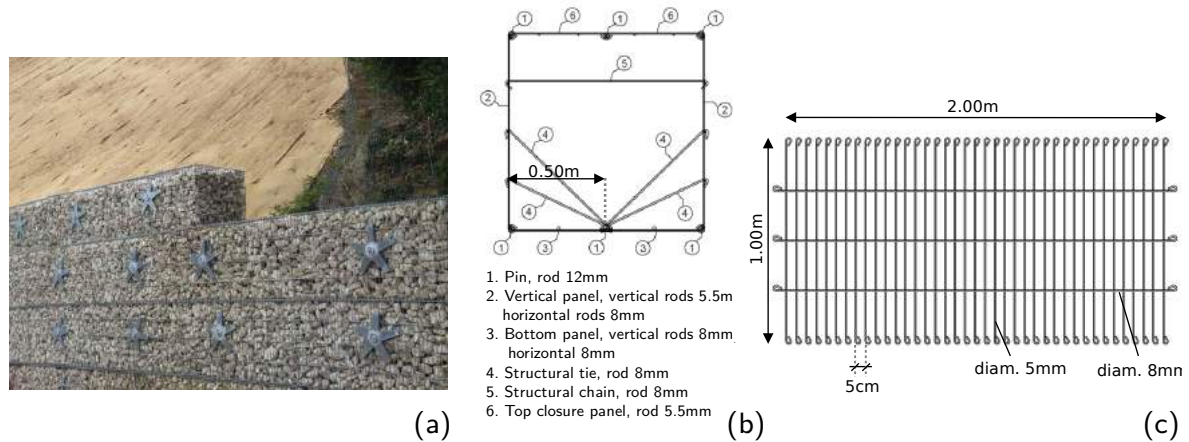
(a) Tie-back earth structure made of gabions combined with self-drilling anchors. (b) Transversal section showing the internal bracing system and (c) frontal view of the gabion's panel.
